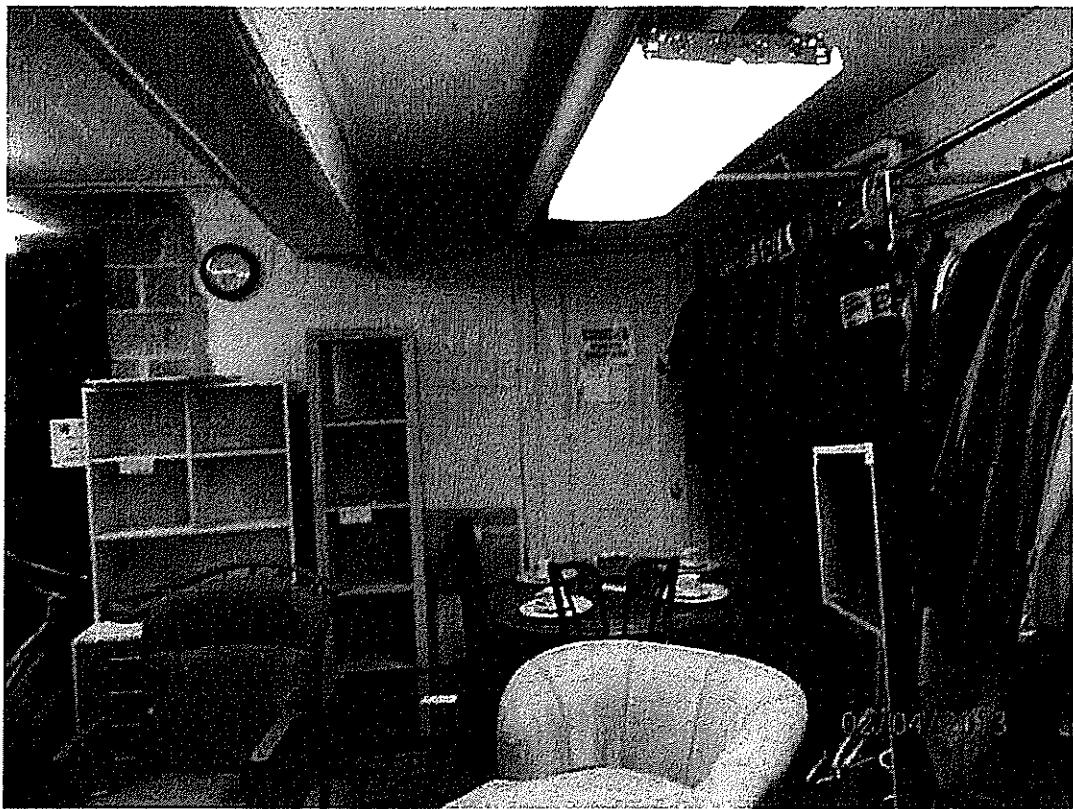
Interior Detail 2140 Market Street, Philadelphia, PA
